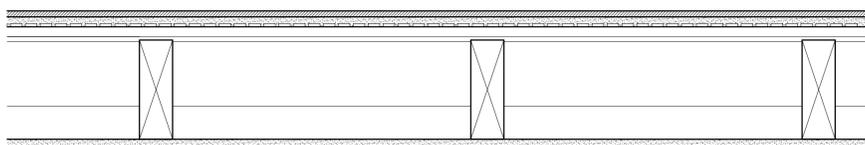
DETAIL H - ROOF VOID TO BEDROOM 1 (BATHROOM 1) - as proposed.
